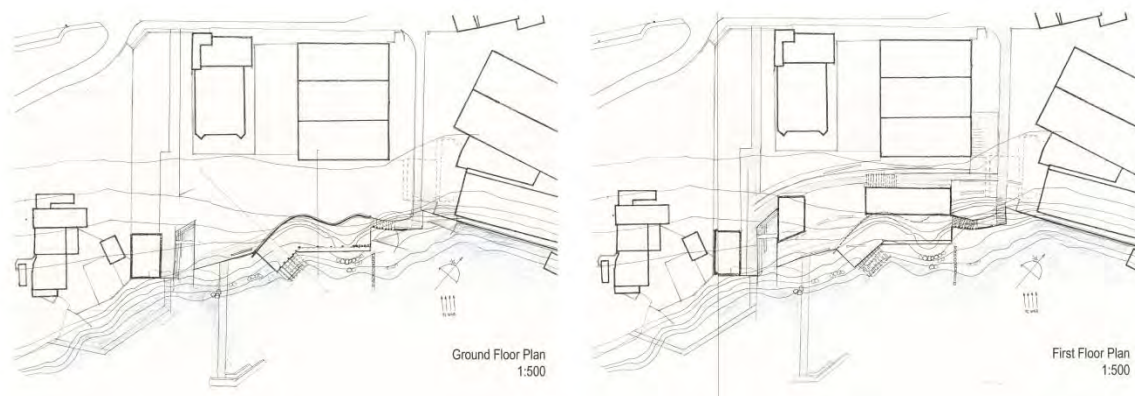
Ground and First Floor Plan of proposed restaurant. (Author, 2013)
